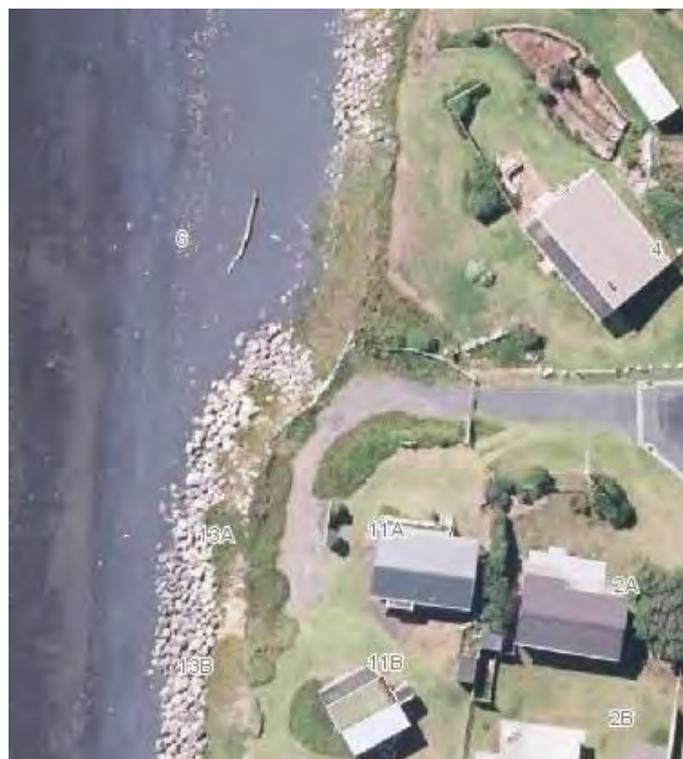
TEMPORARY EROSION PROTECTION STRUCTURE, BEACH ROAD, MOKAU; 2017
